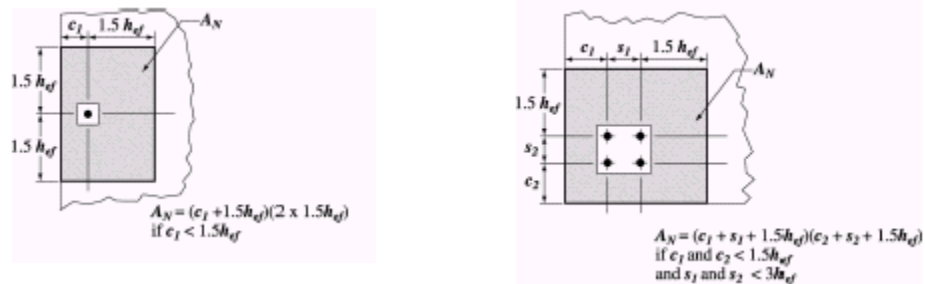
Projected areas for single anchors and anchor groups for the CCD method grouted anchors with the hole diameter greater than or equal to one and a half times the anchor diameter, bond failure can be distinguished at either the steel/grout interface or at the grout/concrete interface. Zamora et al. (2003) presented two variations of this model to account for failure at the inner and outer surfaces of the bonding agent as shown in the following equations for single anchors installed away from a free edge:
